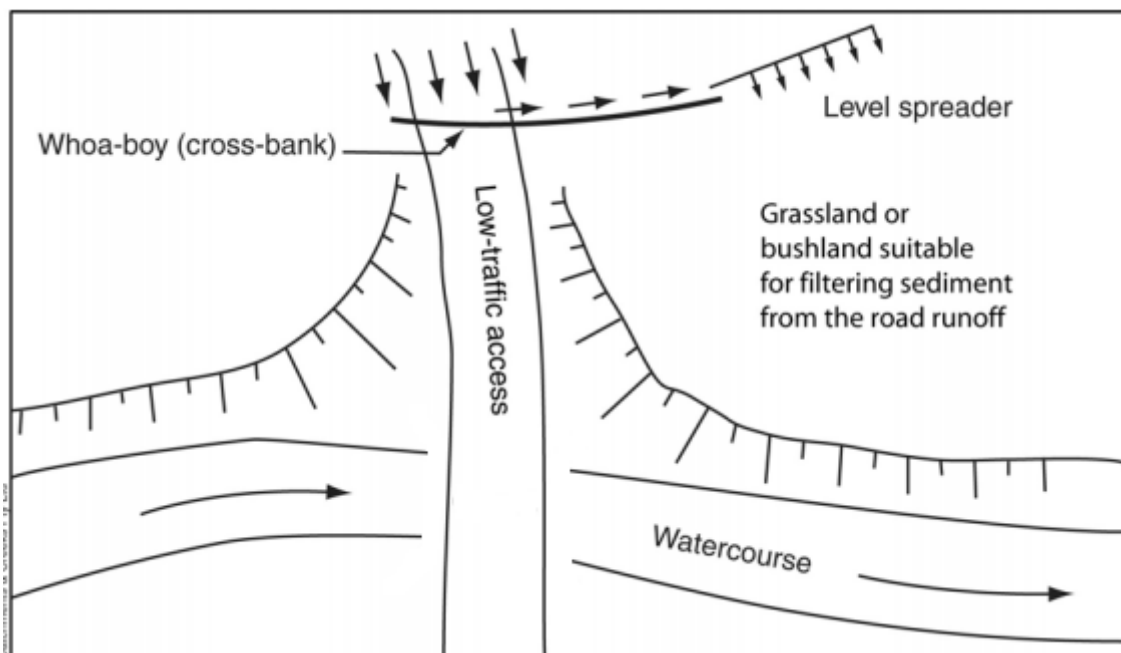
Construction technique for water crossing (IECA, 2008)
